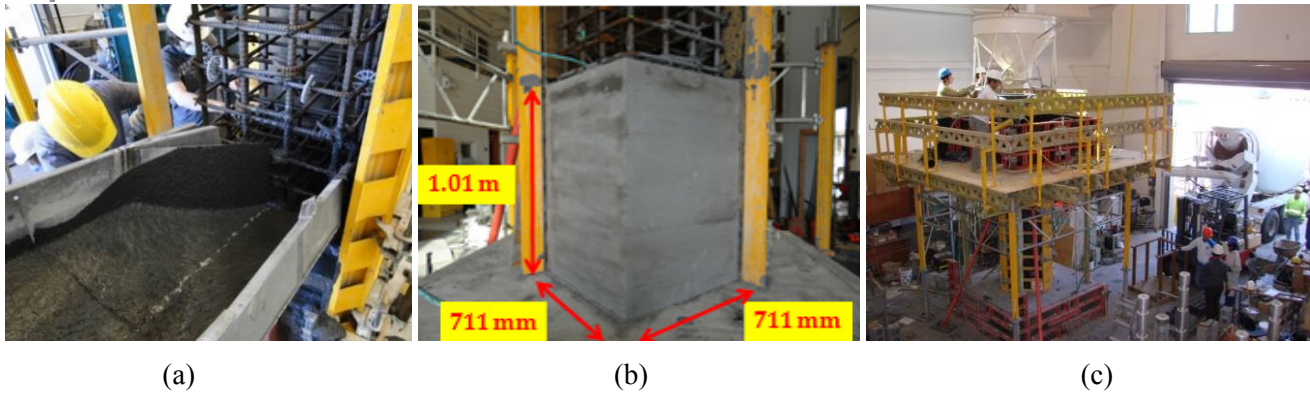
UHP-FRC (a) pouring and (b) completed Section (c) Final Casting
